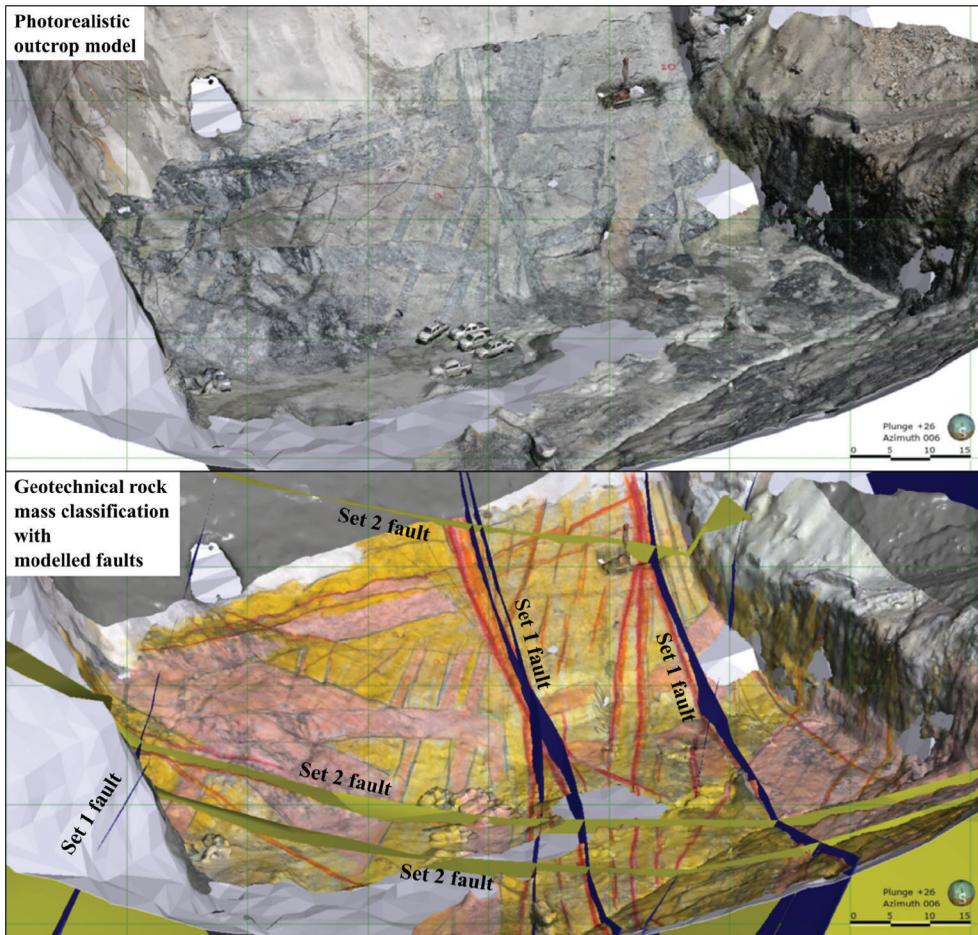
3D fault meshes modeled along fault trace lines in geotechnical documentation of dam excavation draped on 3D as-built excavation surface.
